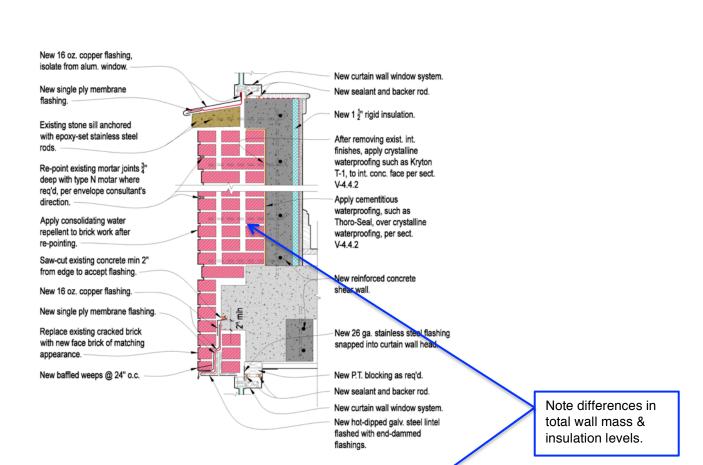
Opt. 1 "Restoration" @ Brick Walls
